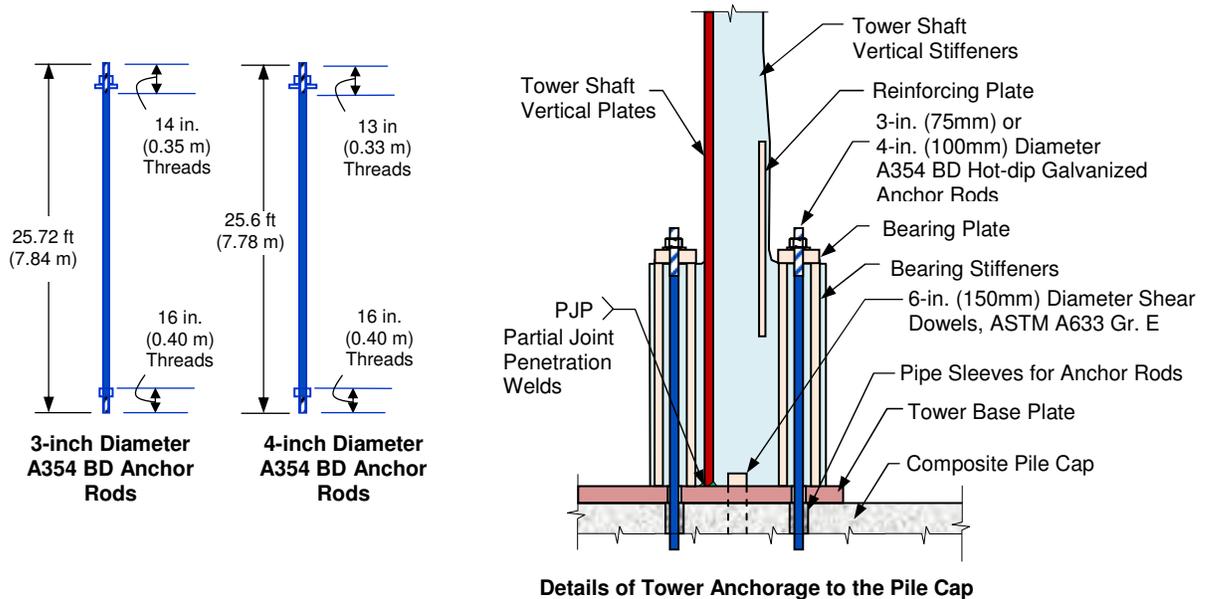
Anchor Rods and Details of Tower Anchorage to the Pile Cap
